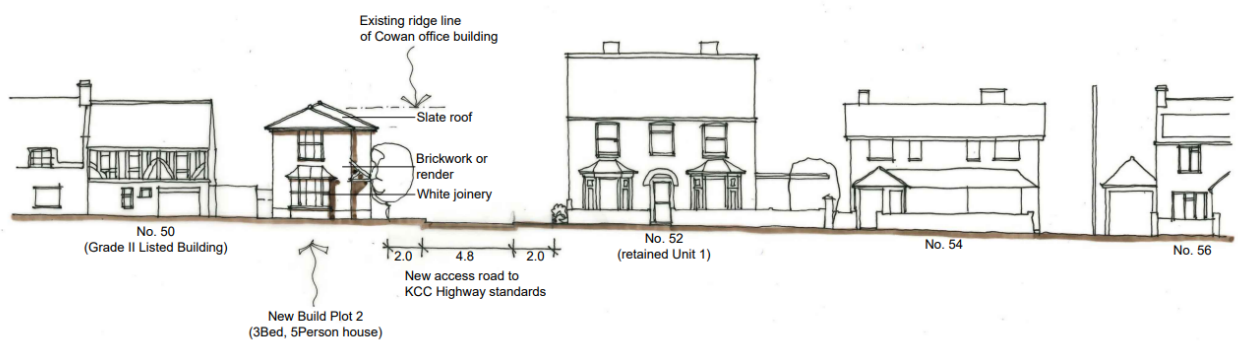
Illustrative proposed street elevation on New Street (not to scale)
